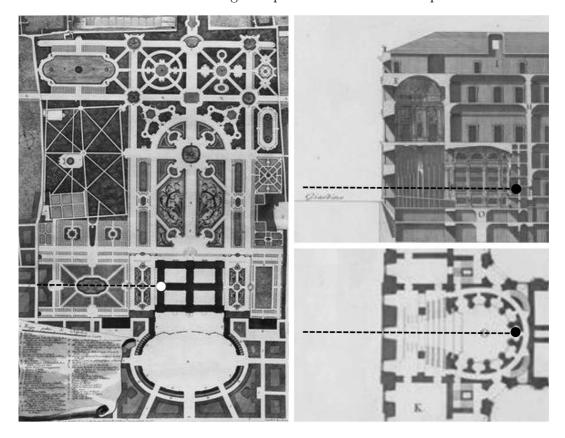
Royal Site in Caserta. Plan of the Palace and Garden.
